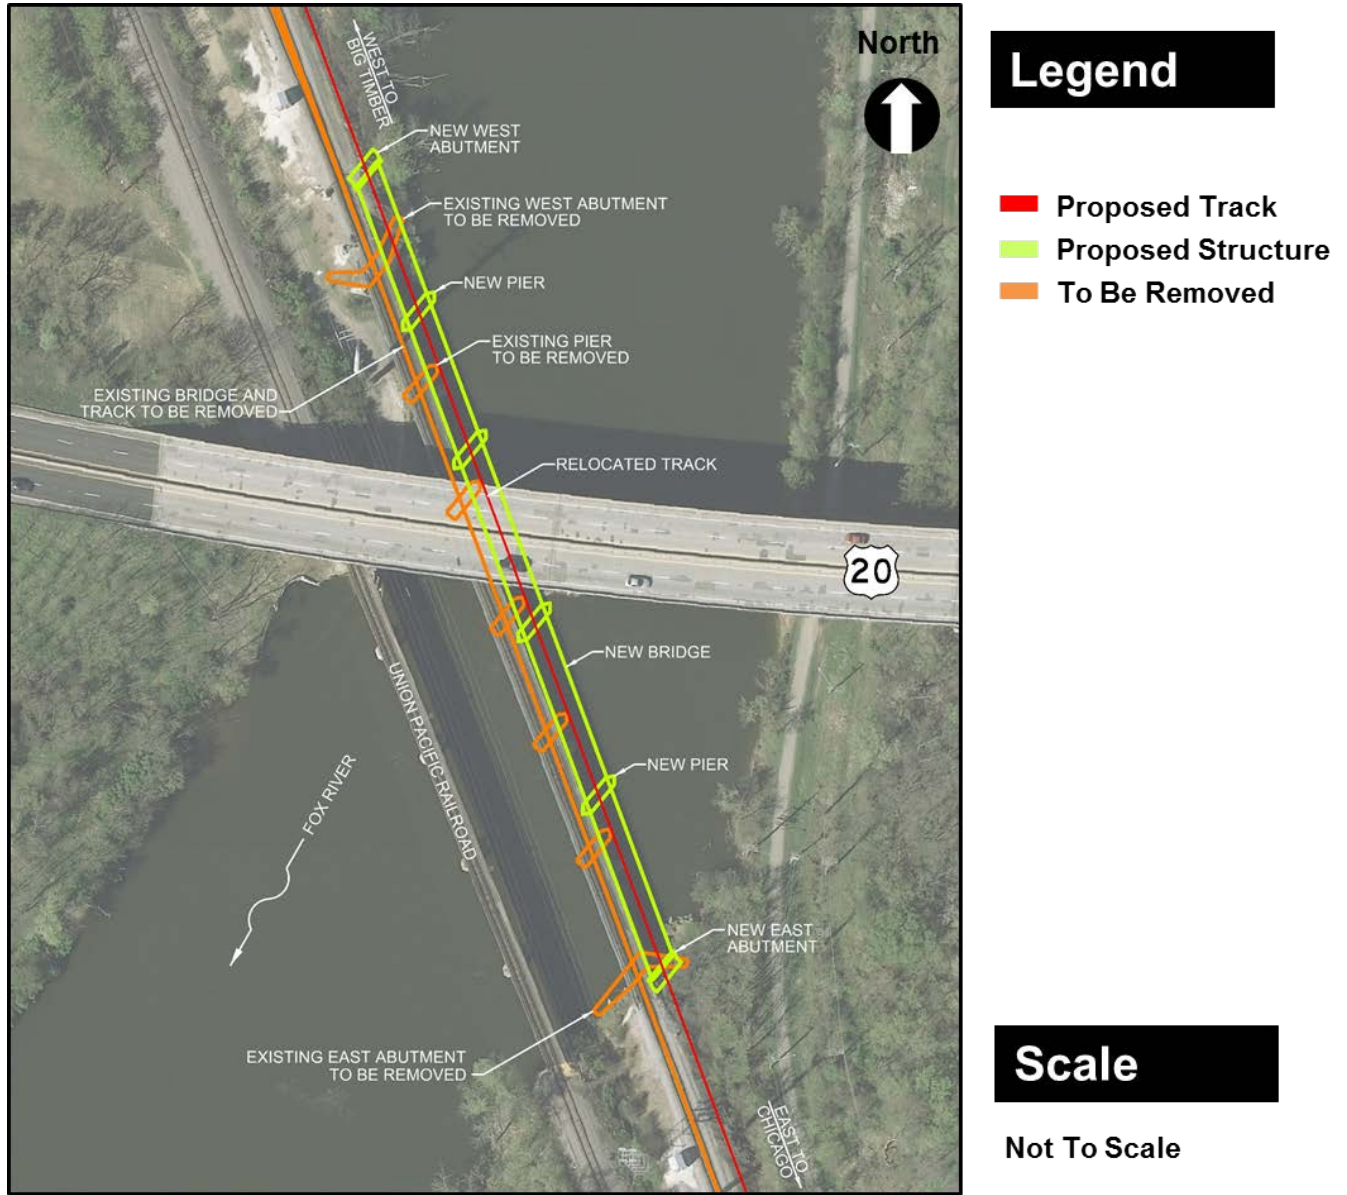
Components of Alternative 3 – Construct a New Single-Track Bridge on an Upstream Alignment
